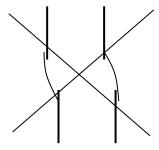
Incorrect installation of flexible connection showing miss-alignment of pipes.
